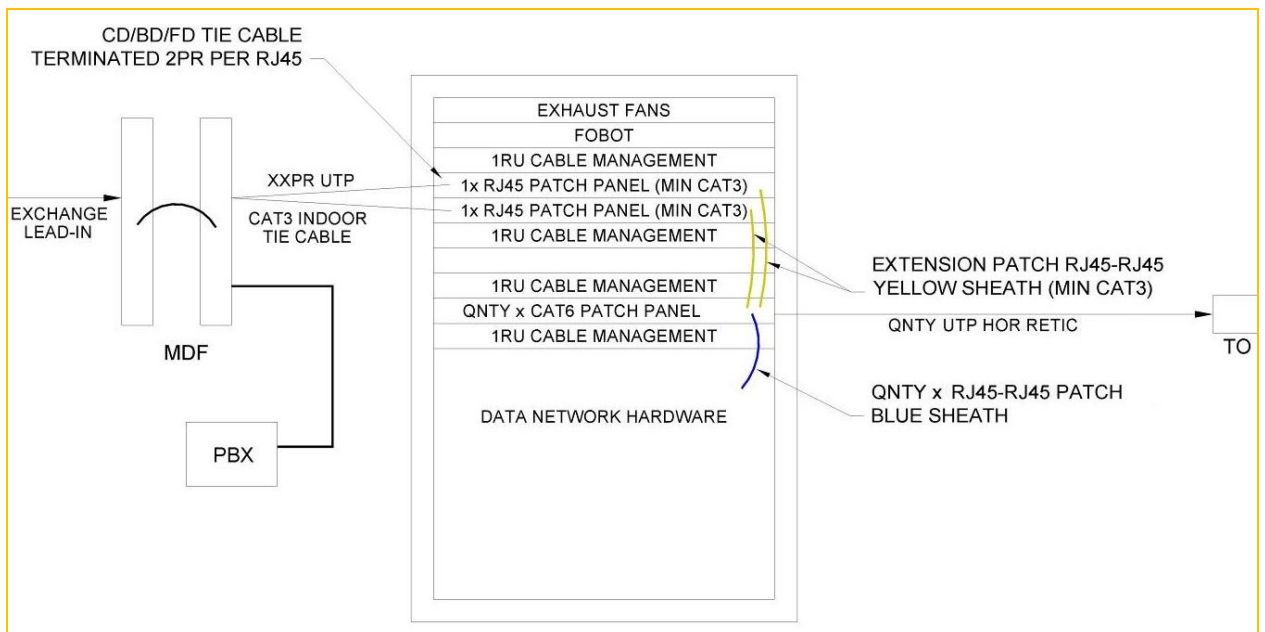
PBX mounted outside cabinet with MDF located in the same room
